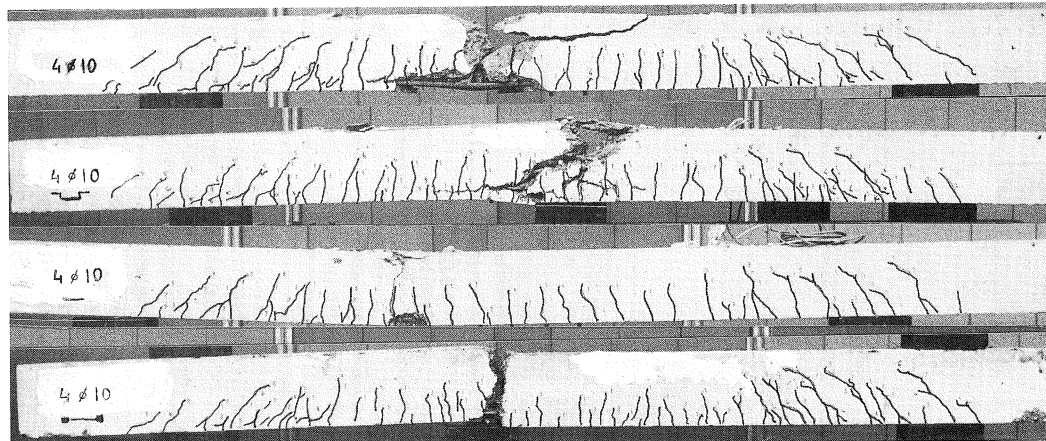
Crack pattern of beams with 4 Ø 10 bars.
